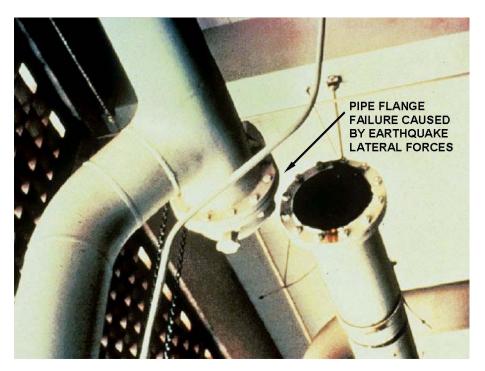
Photo of pipe flange failure caused by earthquake lateral forces. (ATC-20 Training Slide Set photo)
